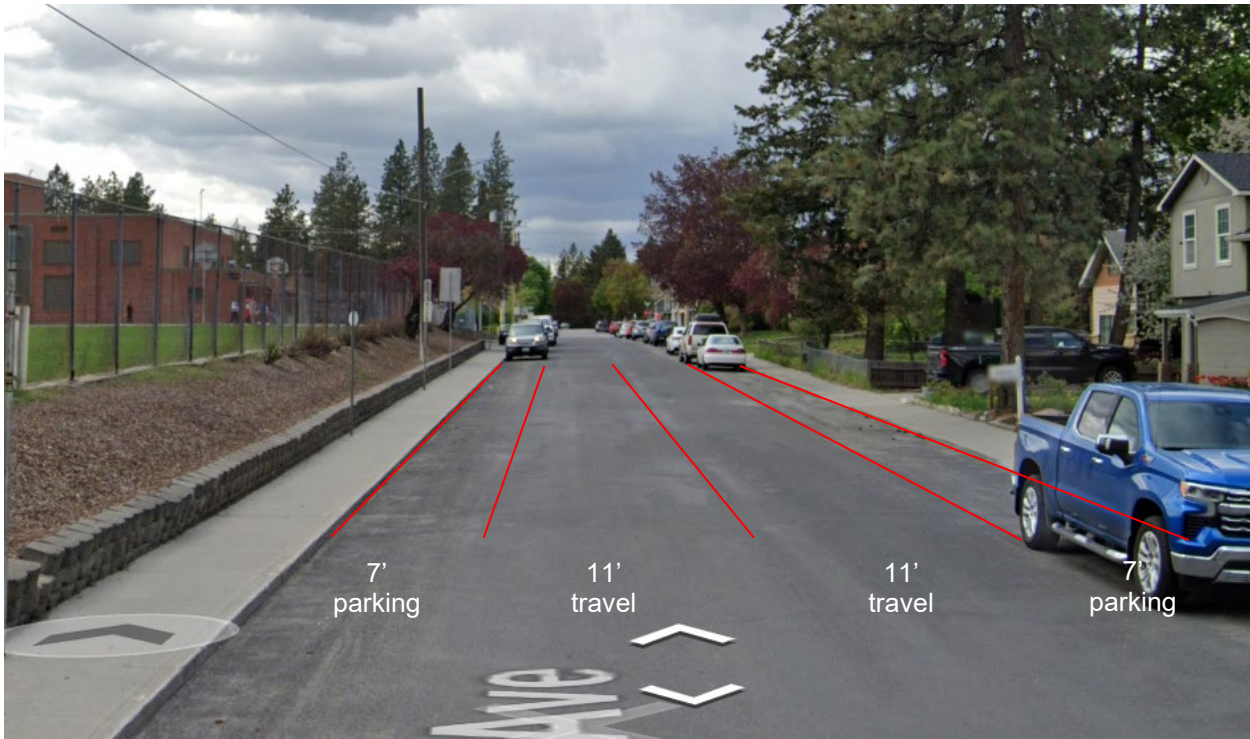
Street view of 36th Avenue, with Adams Elementary on the left (south)
